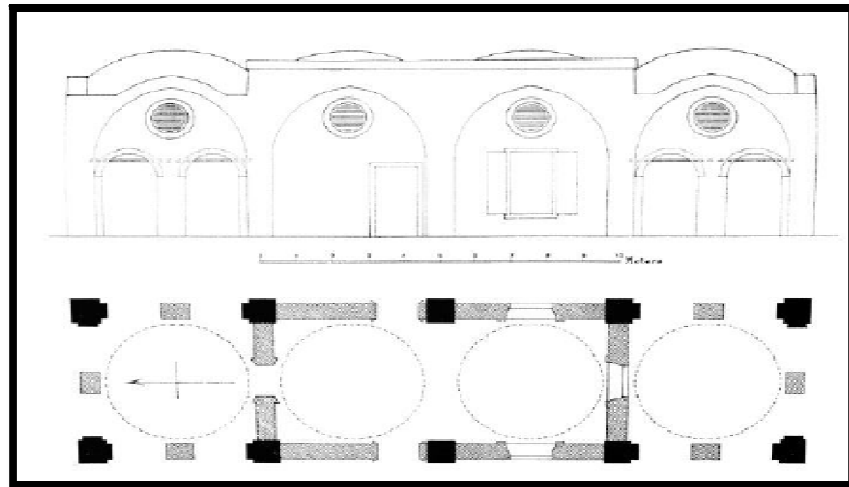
Plan of a mud brick railway station facade, and its horizontal plan, after Clarke, Somers. *The Use of Mud-Brick in Egypt*.
